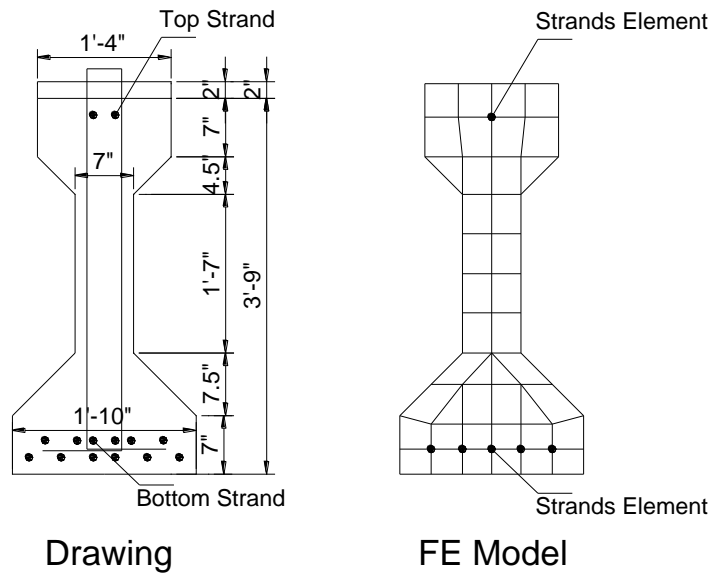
Cross-Sectional View of Archetype 2 Bridge Girder at Mid-Span: (Left) Actual Strands Distribution and (Right) Strand Elements in FE Model
